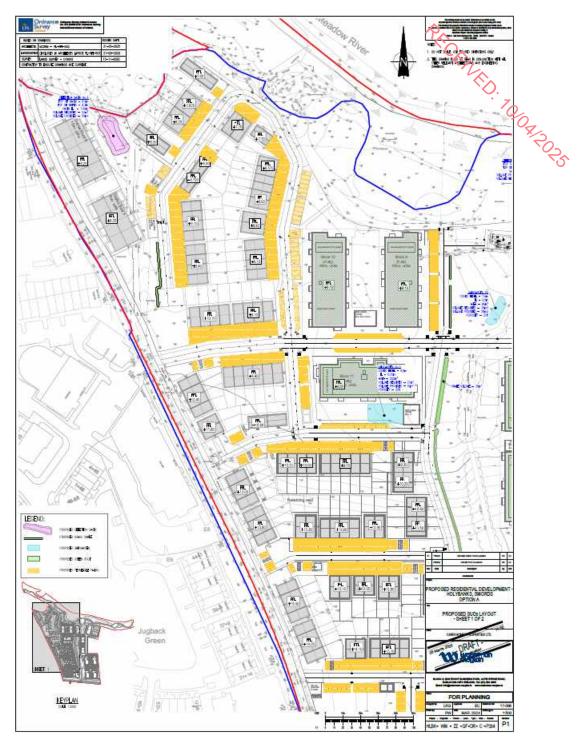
SUDS LAYOUT (WESTERN) (TOWNHOUSE) (DRG NO. P204, WATERMAN MOYLAN 2025).
